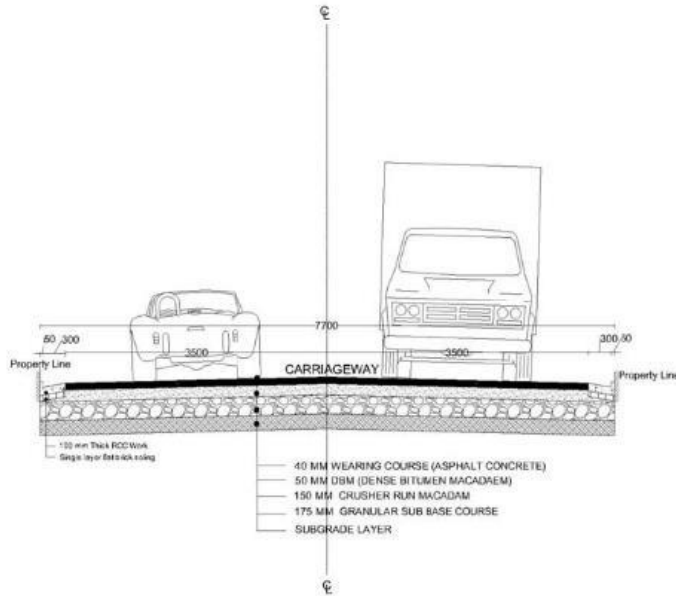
Typical Cross section for 7.7 m road (section Type A)
